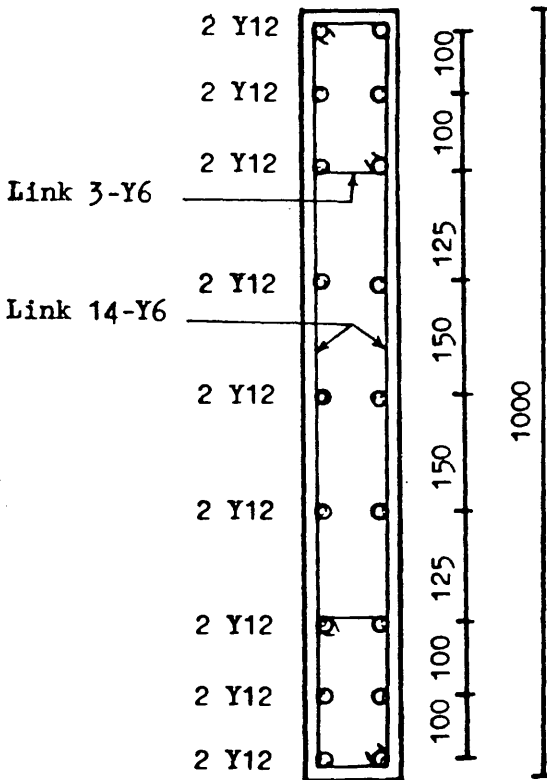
A horizontal section in the wall of model MRS14 showing the reinforcing details
